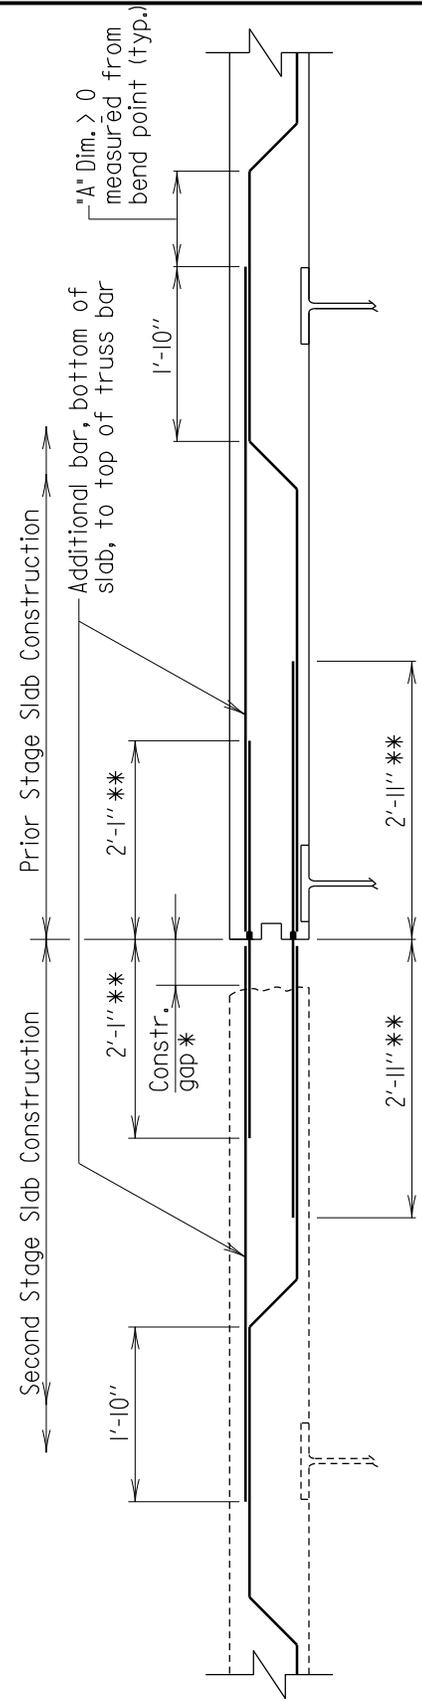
DETAIL NO. SUP-BD(SC)-102 SHEET 2 OF 4
